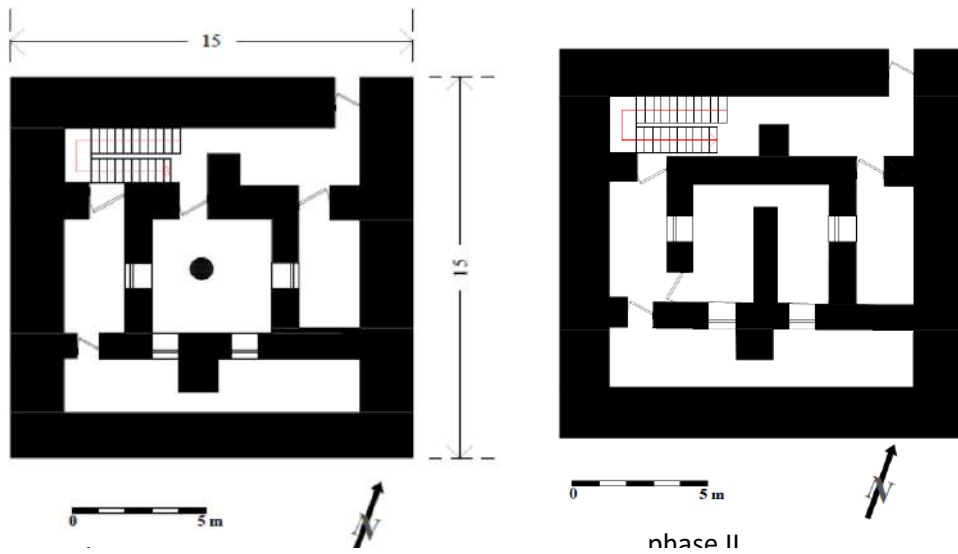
Amman Airport Temple first floor plan, phase I, II.
